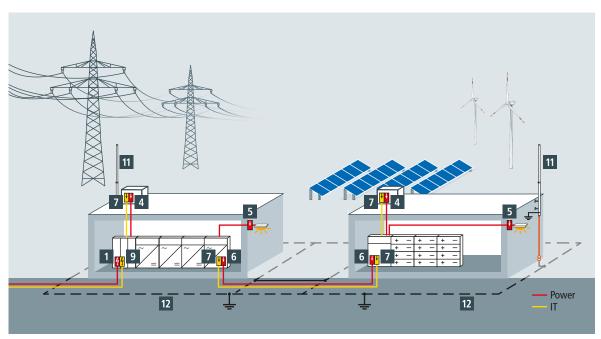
Battery storage system for power grid as a concrete construction with HVI Lightning protection
